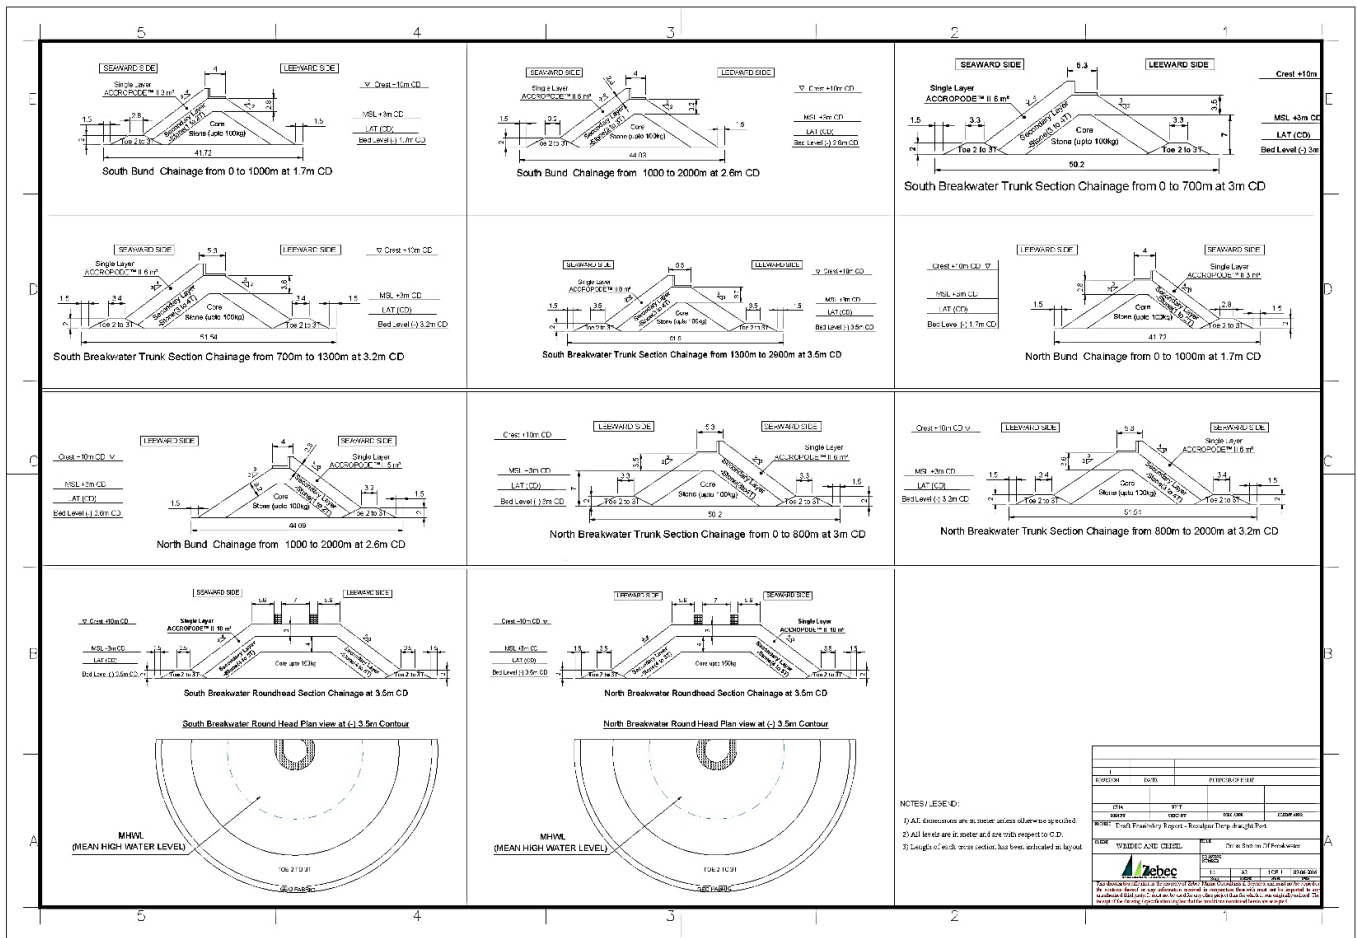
Design of the Trunk Section of the South Breakwater at the 3 m contour
